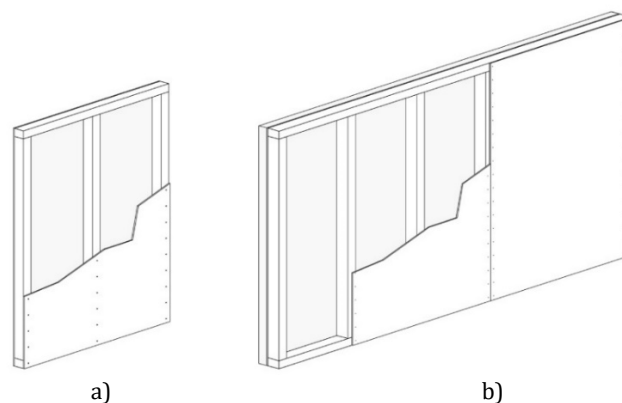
a) Single-panel and b) Macro-panel prefabricated LTF wall element [16]
